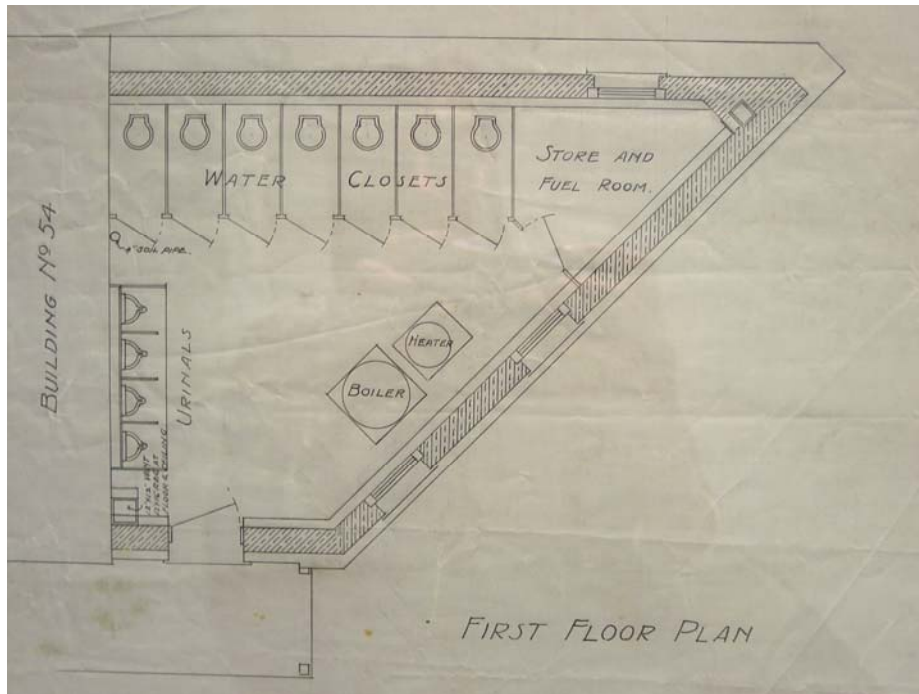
Details of proposed lavatory fixtures for the first story of the east addition to the north barrack, November 1898.
